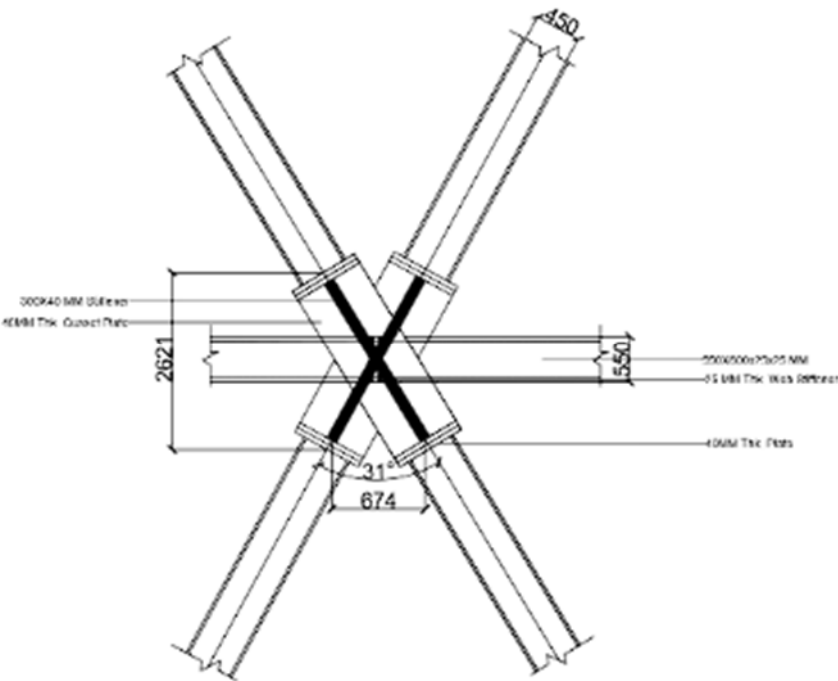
Standard junction detail of the 36-story diagrid structure.
